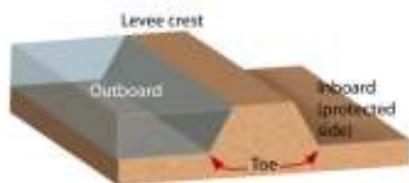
Typical levee construction for flood control (National Science Foundation 2010)
